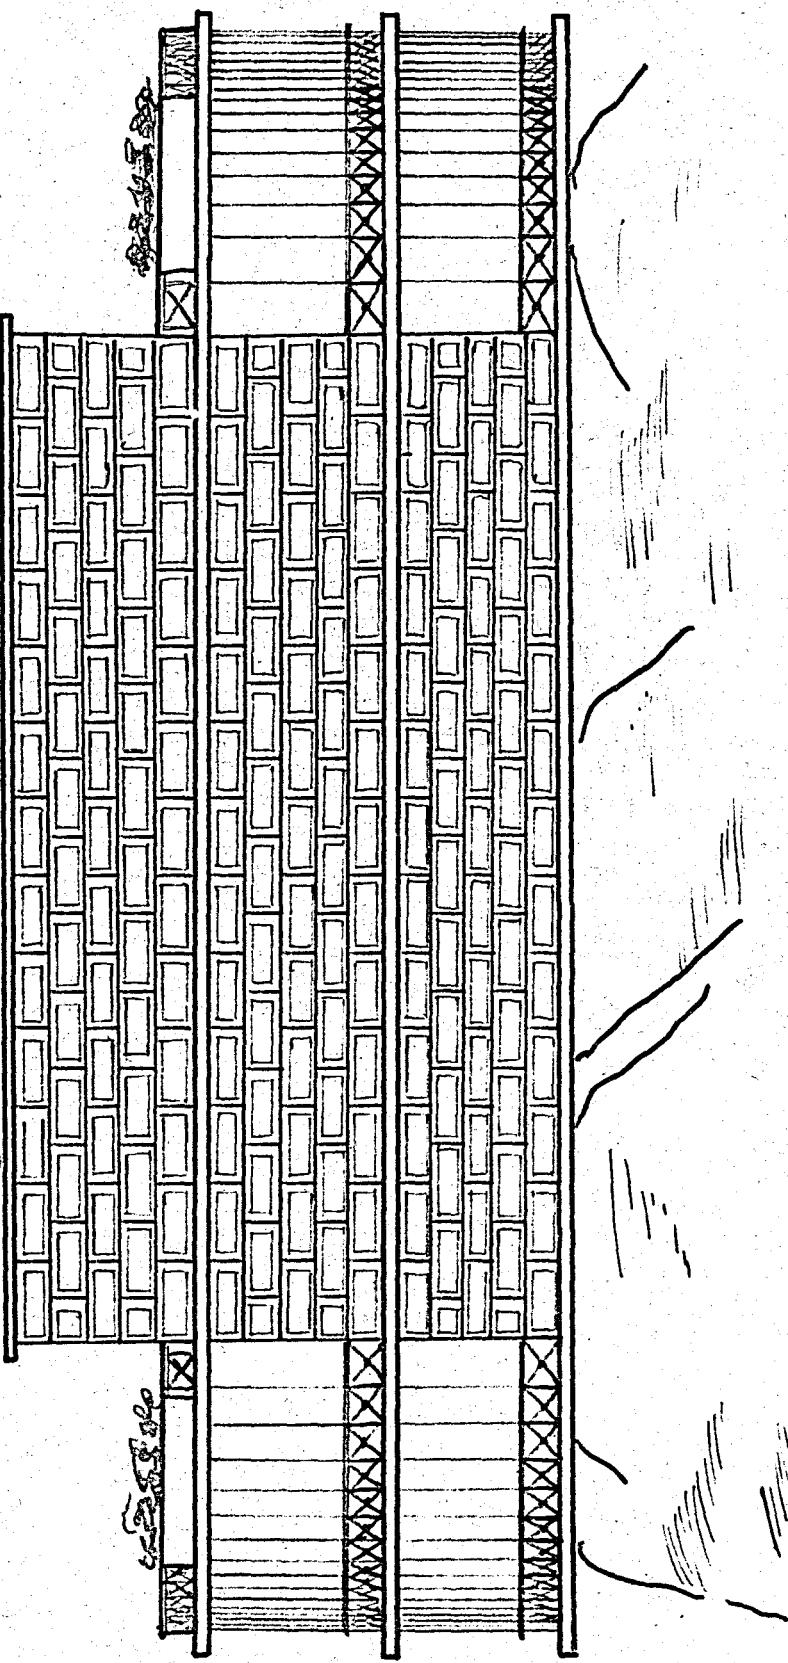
General View of the Casino Looking From North - East (Scale 1/200)
